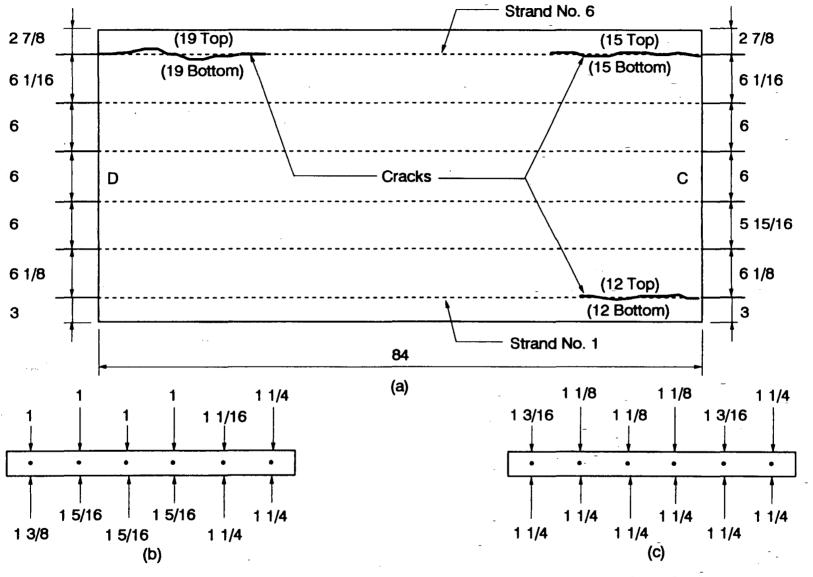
Specimen No. 5-2.5TC-3 (dimensions shown in inches):
